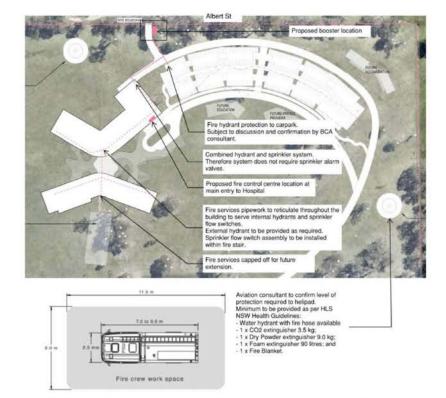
New Fire Services connection from Albert Street with external and internal hydrants to achieve a full coverage.
